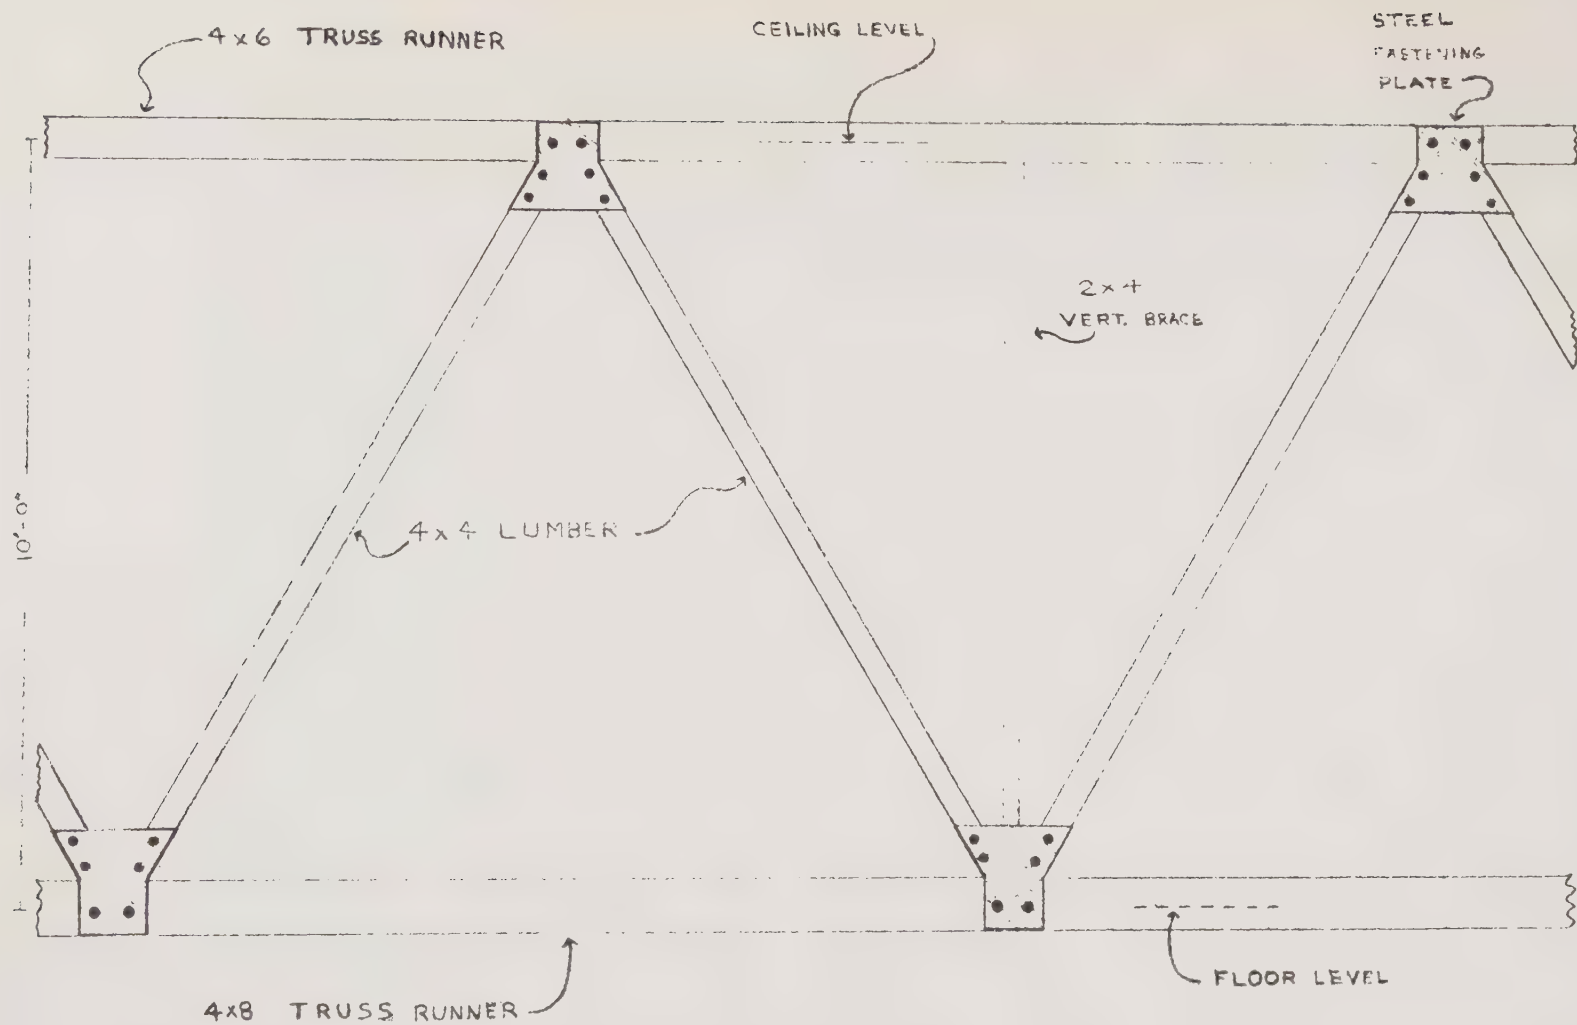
THE PRISMATIC BUILDING SYSTEM
